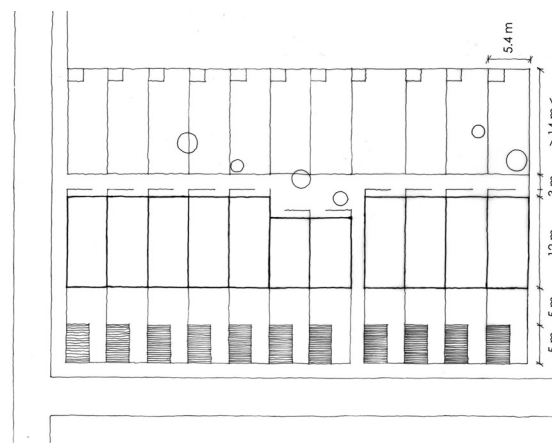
General site layout, which could be adopted and adapted to suit other sites 1:100
